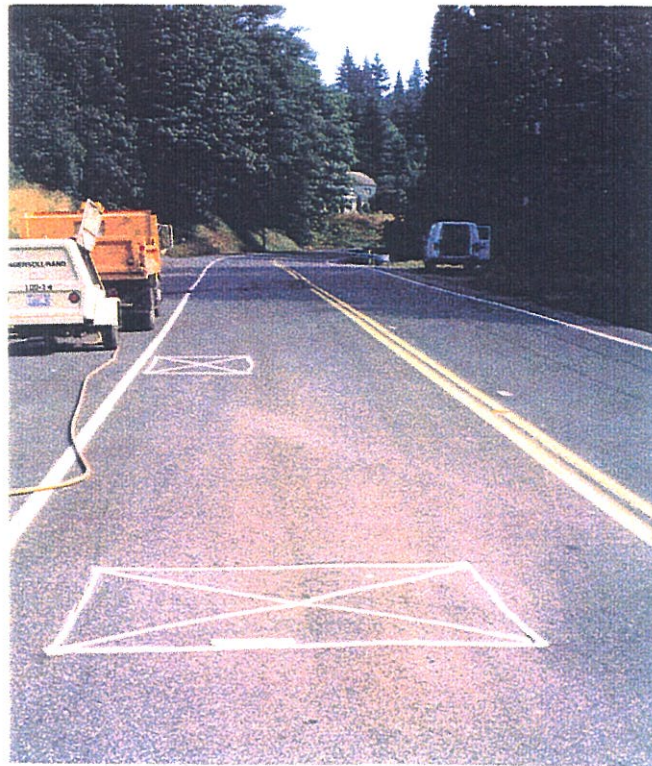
Testpit layout; testpit 1a is in the foreground.
